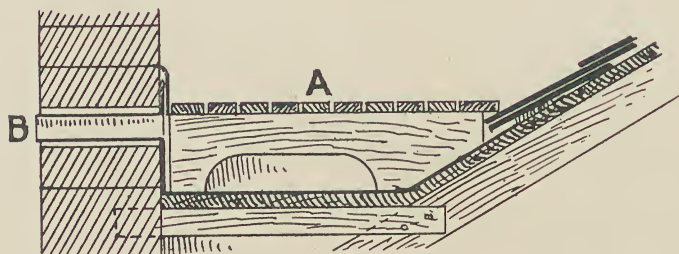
Transverse Section of Parapet-gutter with Snow-boards.
